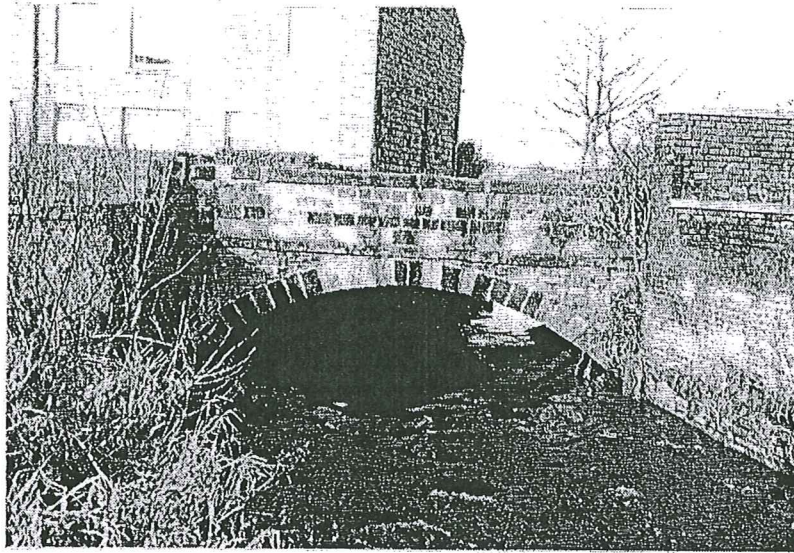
STATION ROAD BRIDGE AND UNION STREET BRIDGE
